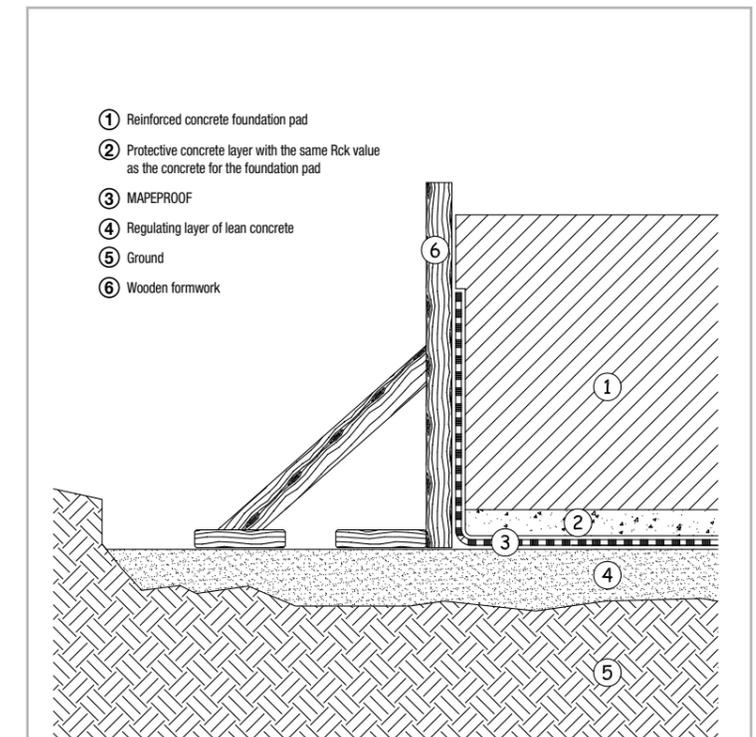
Detailed layout of MAPEPROOF applied on wooden formwork
